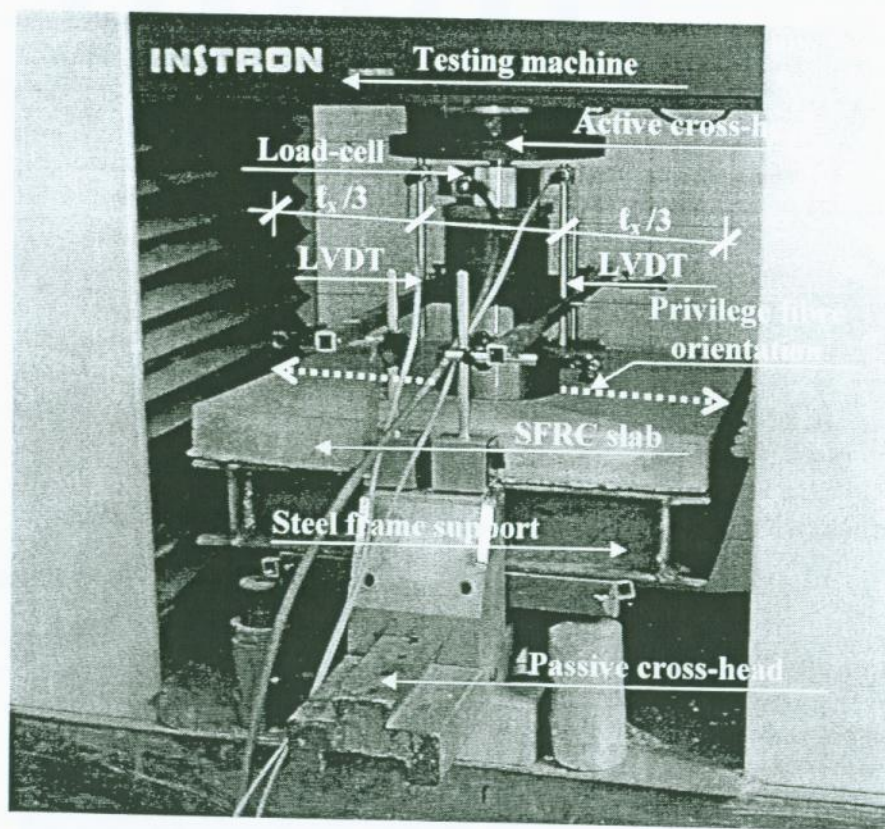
Test set-up and test arrangement of bending test of steel fibre reinforced concrete slabs
